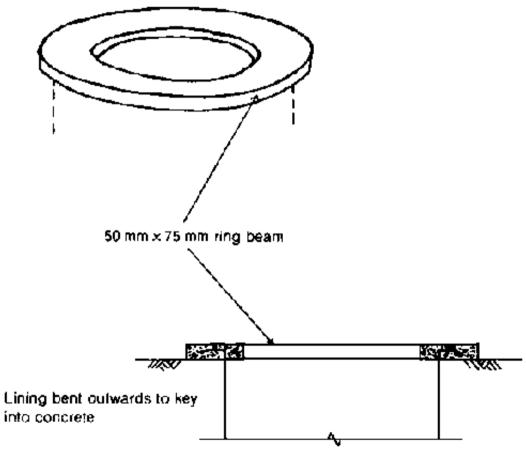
Ring beam on top of a thin pit lining to support the cover slab
